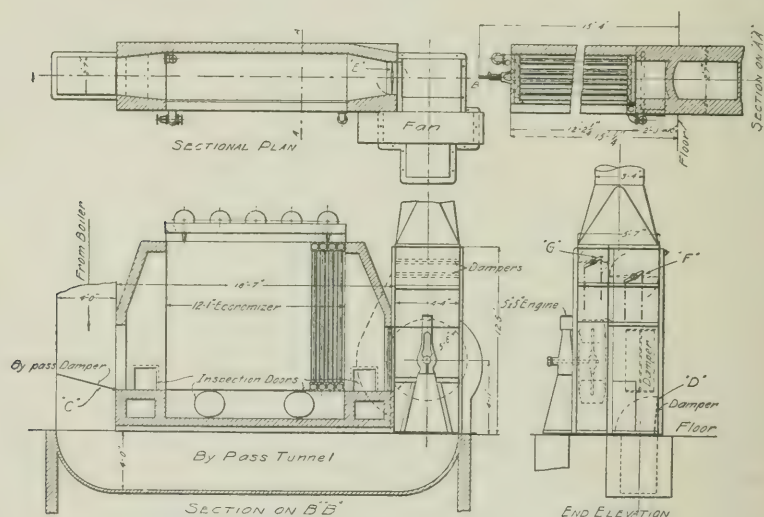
SECTIONAL VIEWS OF THE INDUCED DRAFT SYSTEM AND THE ECONOMIZER.
